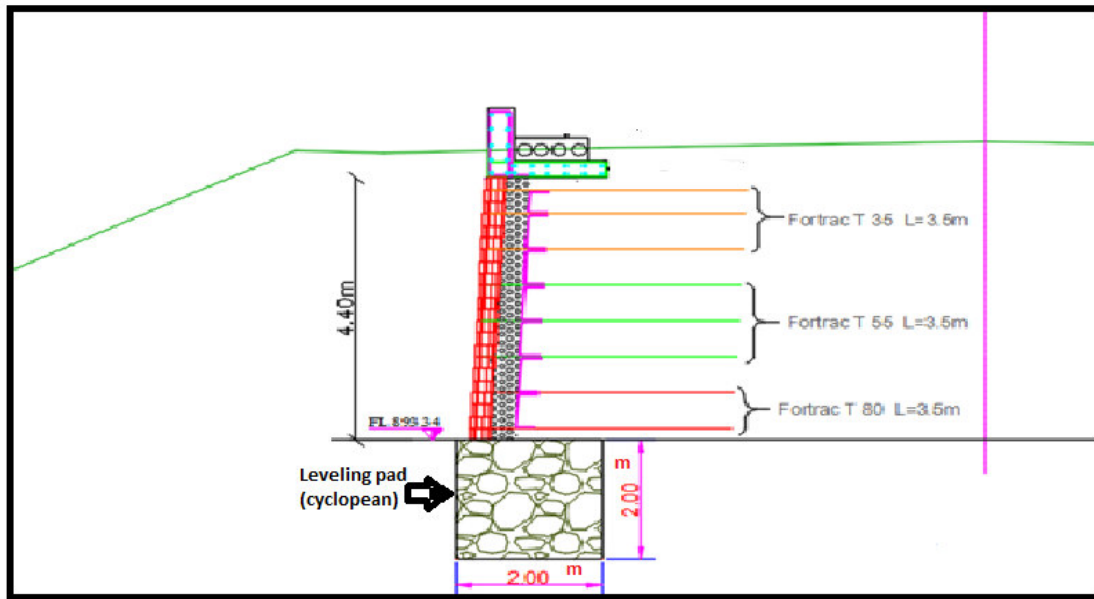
The General Design of the Proposed Geo-Synthetic (Fortrac) Reinforced Soil Wall Using GGU Stability Software
